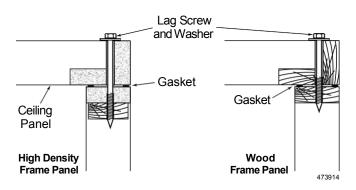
Ceiling to Wall Attachment (Lag-Down)
